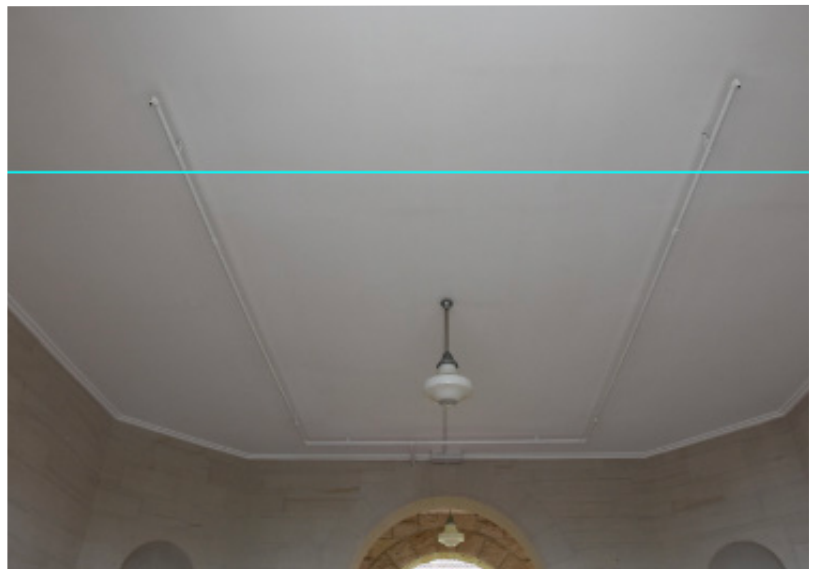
Ceiling to entry space. Essential services, sprinklers installed have no more than minimal impact on the heritage fabric.
